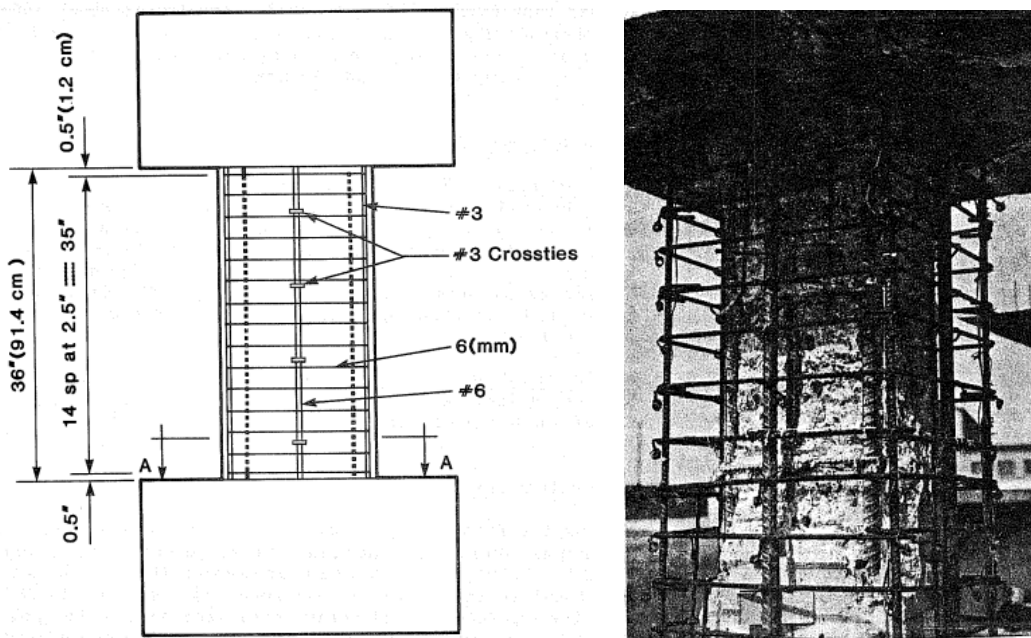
Elevation view of the retrofitted column and image of the bars for jacking (Bett, 1985)
